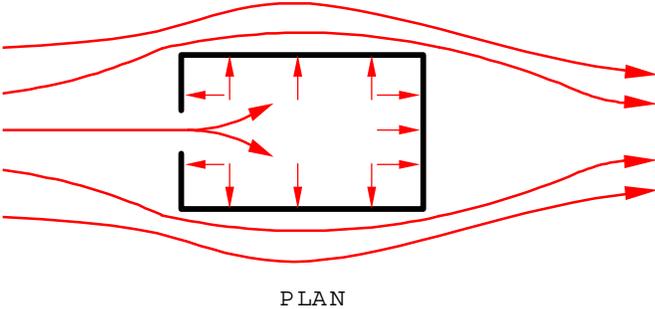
Internal Pressures Caused by Windward Wall Openings
